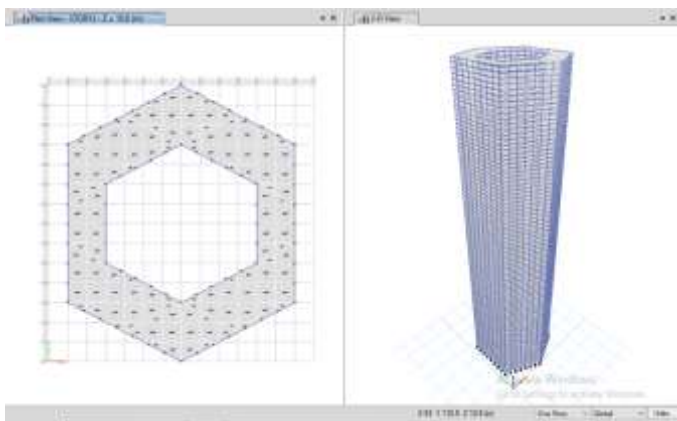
Framed Tube Structure: Hexagonal in Plan
